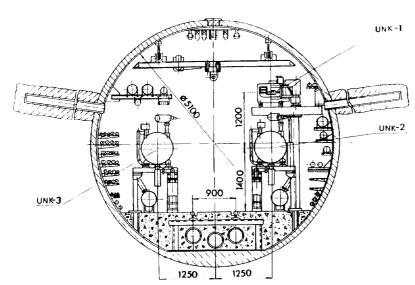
Equipment layout in the cross section of the UNK tunnel.
